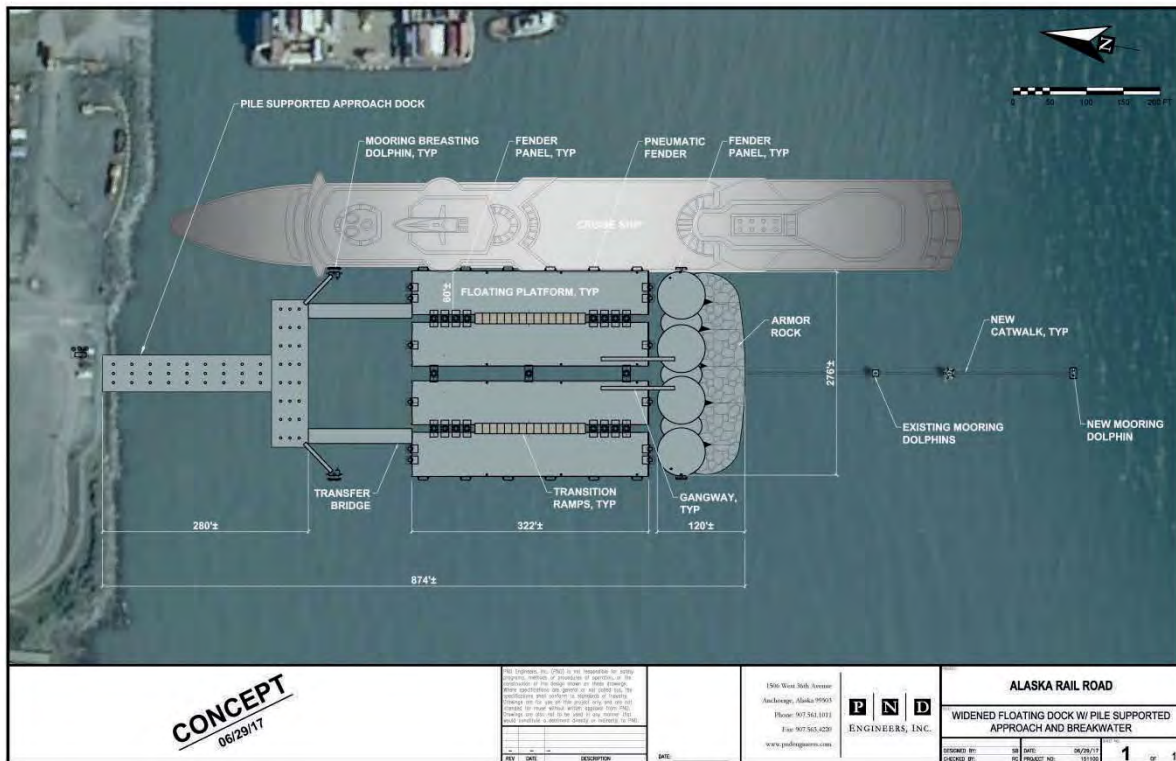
Option P-PD12: Open Pile Supported Dock with Floating Platforms and Sheet Pile Armor Rock Head
